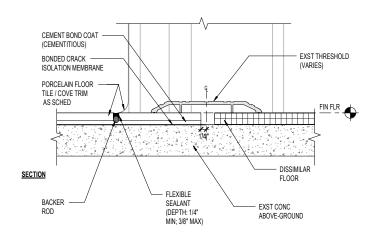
DETAIL EXPANSION FIELD JOINT 6"=1":0"
